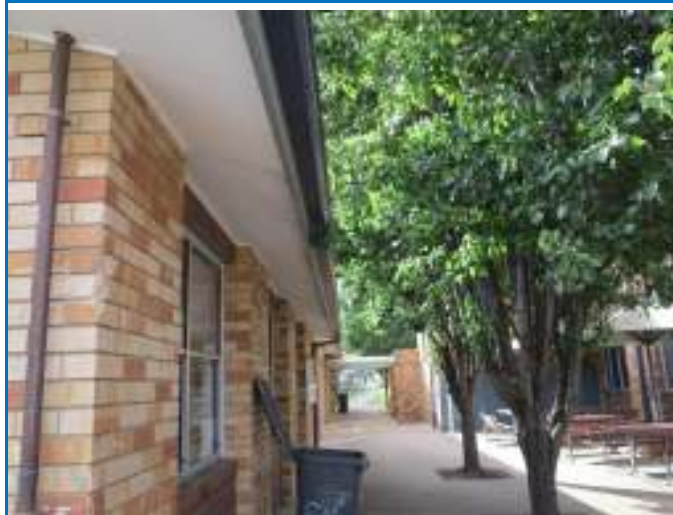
Block C. Eaves Lined With Fibre Cement.
